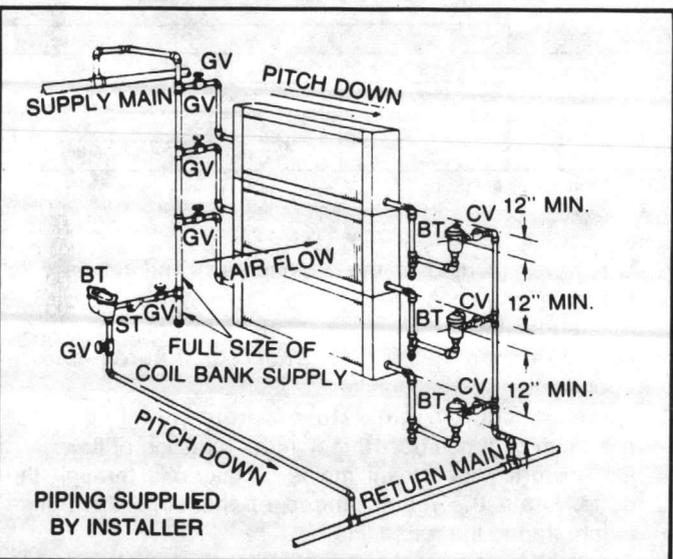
Typical Piping for Type A Steam Coils, High Pressure, Horizontal Tubes for Horizontal Airflow
